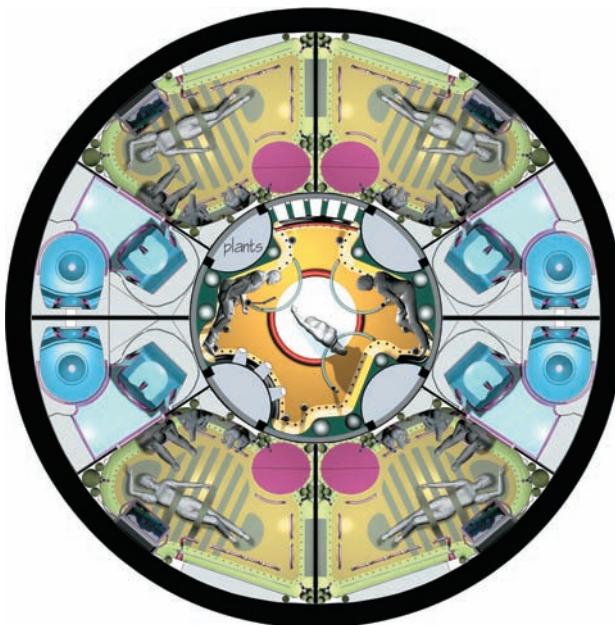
Second-level floor plan: clockwise from top—private room, bathroom, bar upper level, second bathroom and small private room, health-care room, restaurant upper level, and gymnasium.
